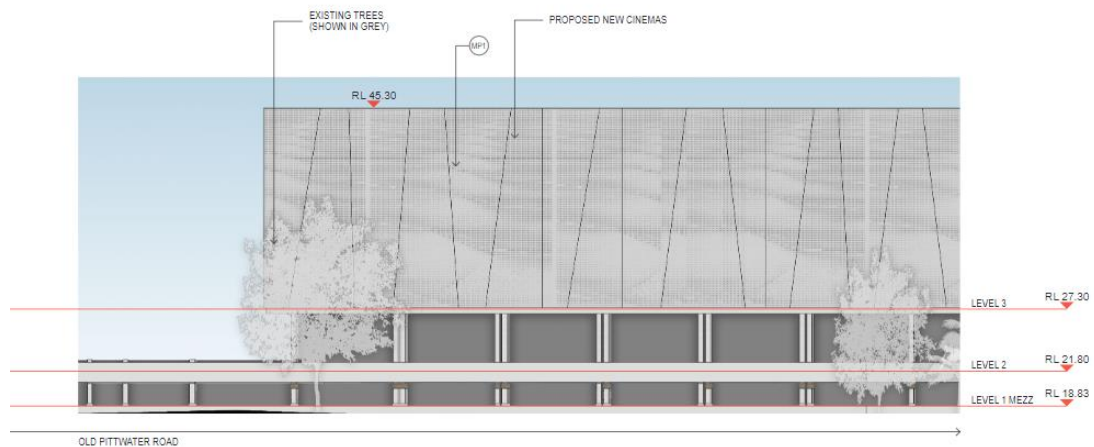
Proposed Amended Old Pittwater Road Elevation
